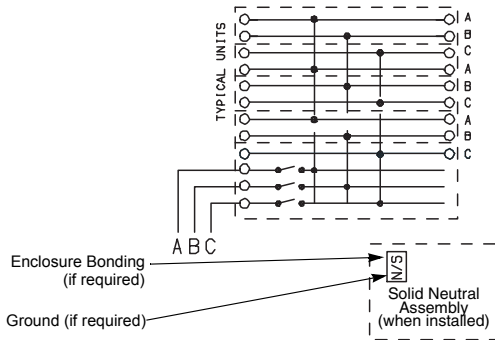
Typical Wiring—400 A and 600 A Main Switch
